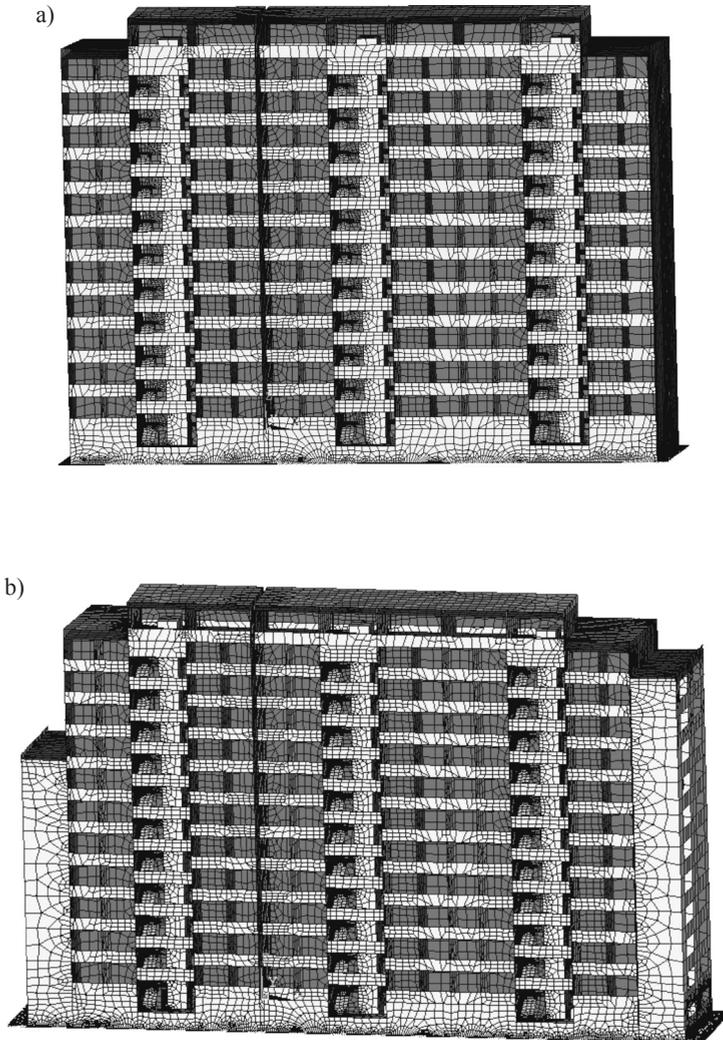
Finite element models of the analysed structure: a) building “A0”; b) building “A1” [6]
